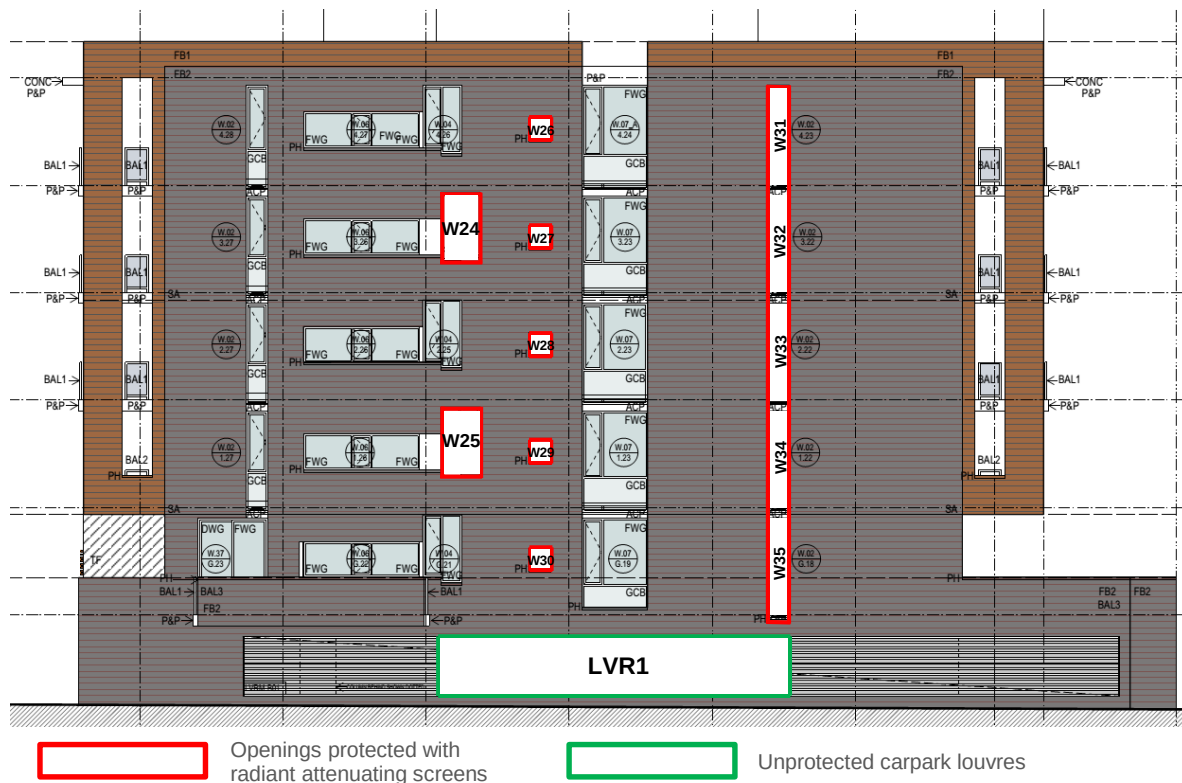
Openings on east elevation of 15 Sturt Street within 3m of subdivision boundary
